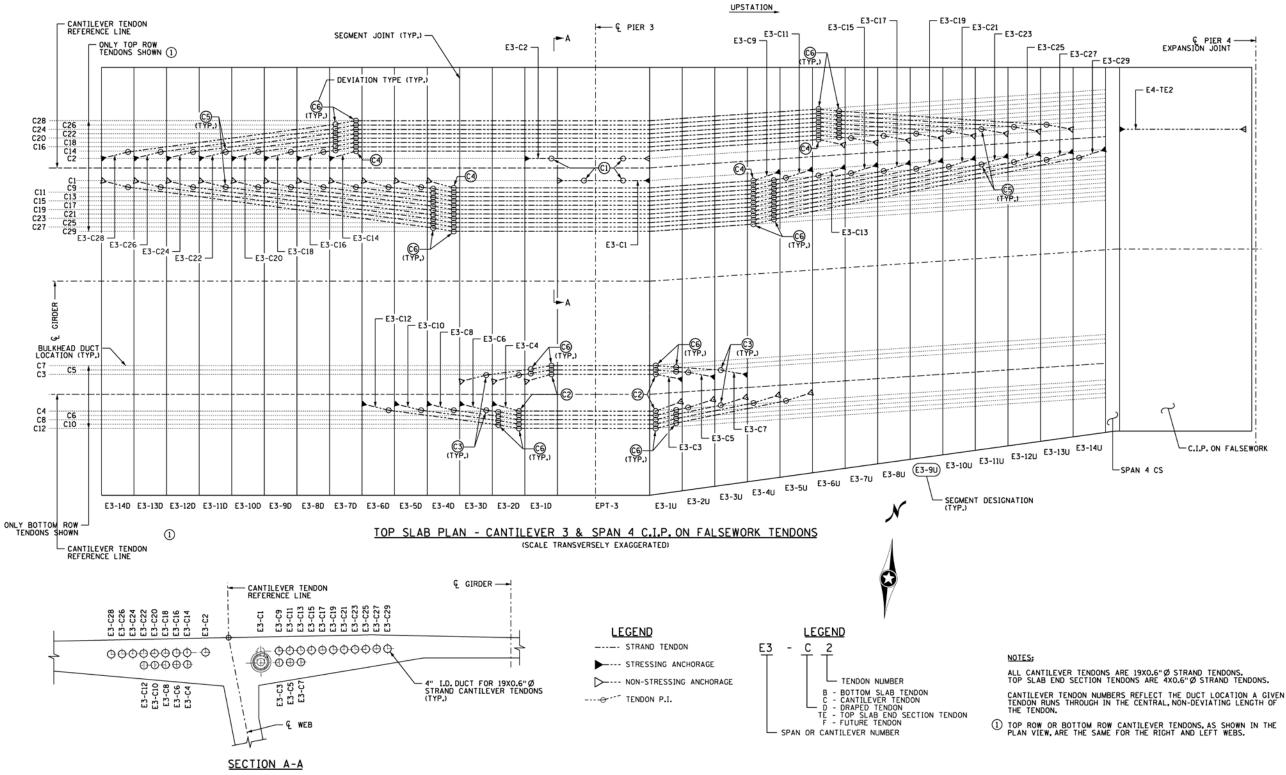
Eastbound Cantilever 3 and Span 4 C.I.P. Cantilever Post-Tensioning Layout
